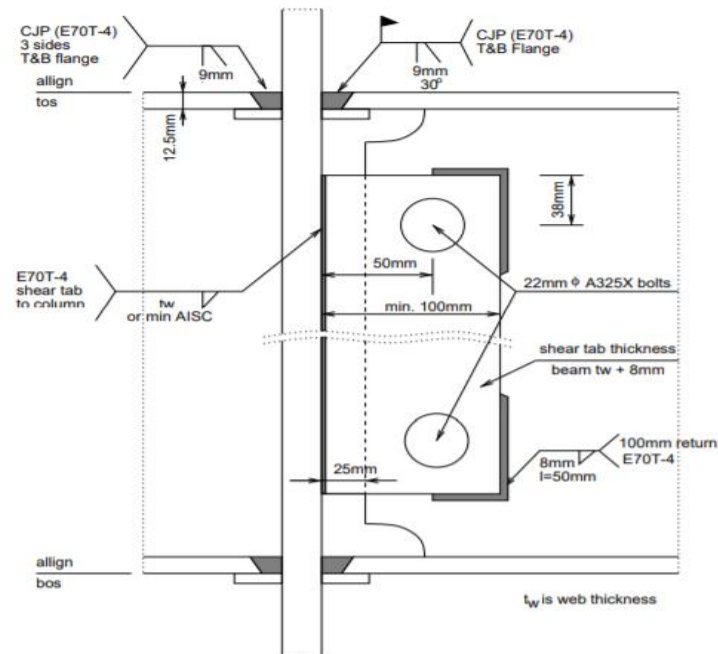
Pre-Northridge Connection Detail – (STOJADINOVIC, 2000)
